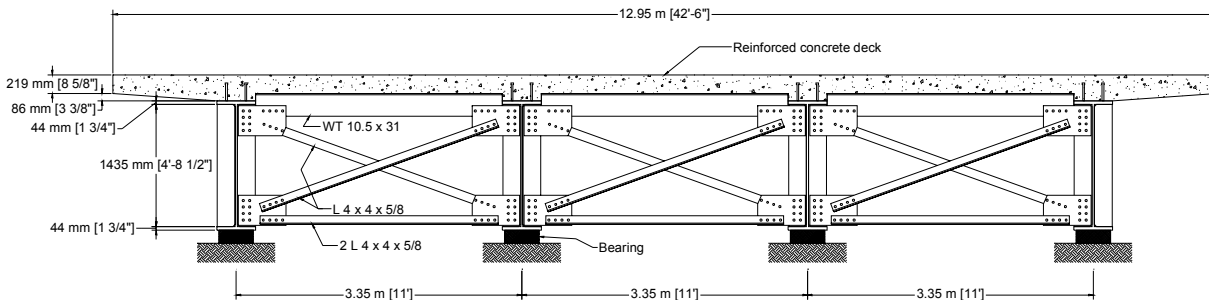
Full scale bridge model - transverse bracing at abutments.
